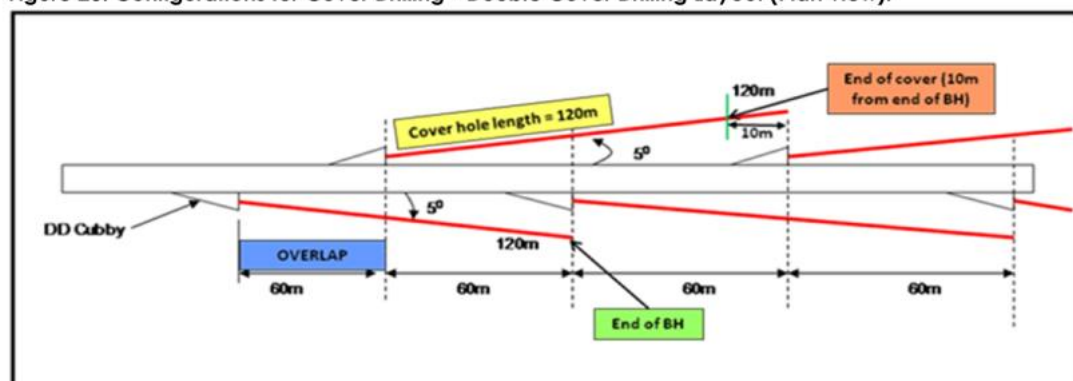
Configurations for Cover Drilling - Double Cover Drilling Layout (Plan view).
